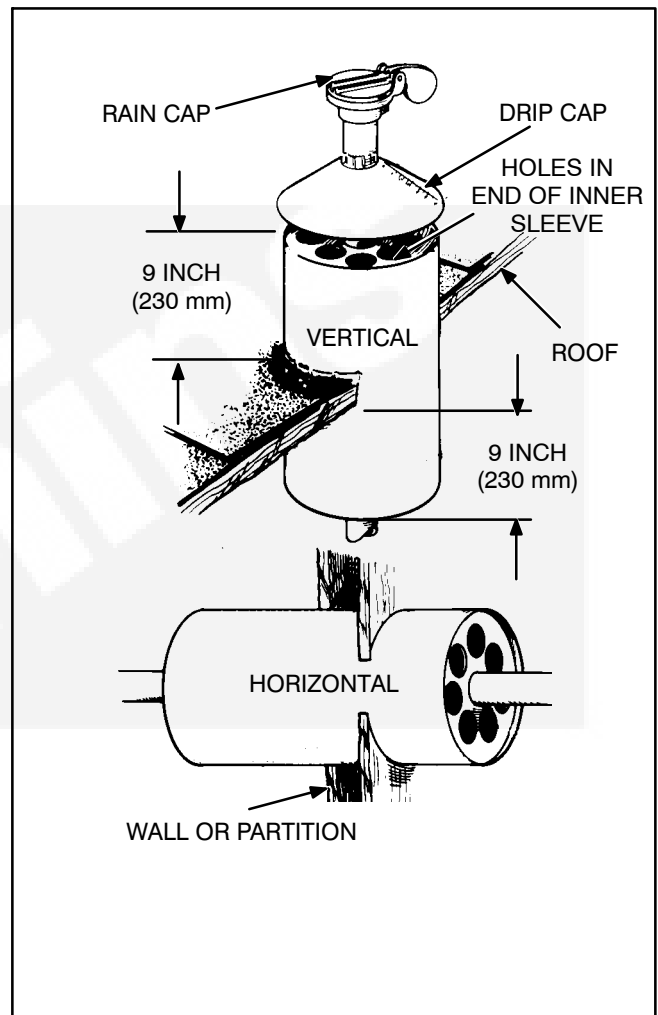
MOUNTING EXHAUST THIMBLE
